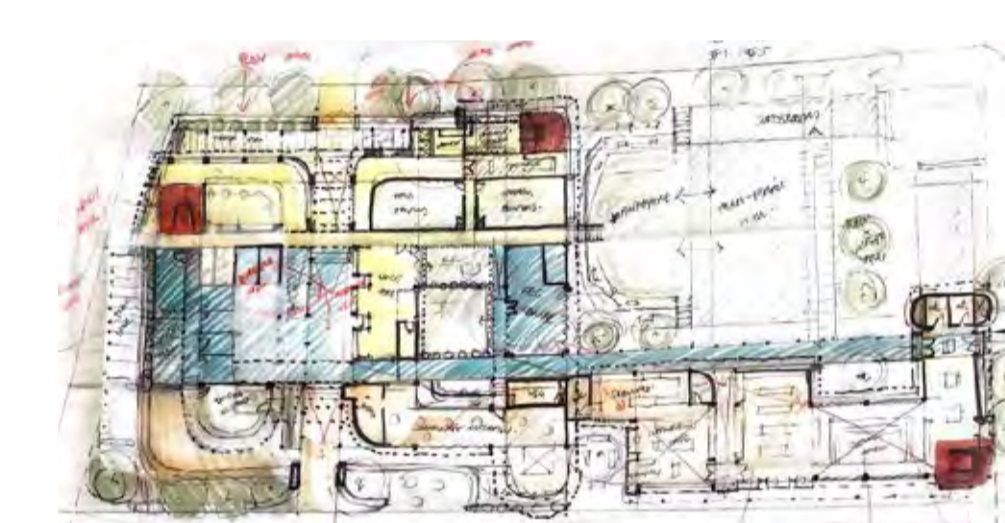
Floor plan development and initial spatial refinement (Author, 2023).
